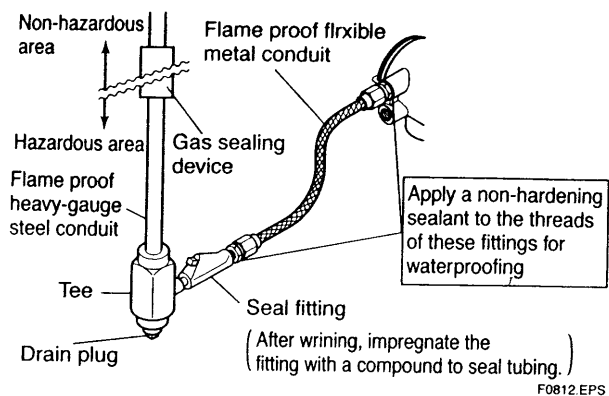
Typical Wiring Using Flame proof Metal Conduit
